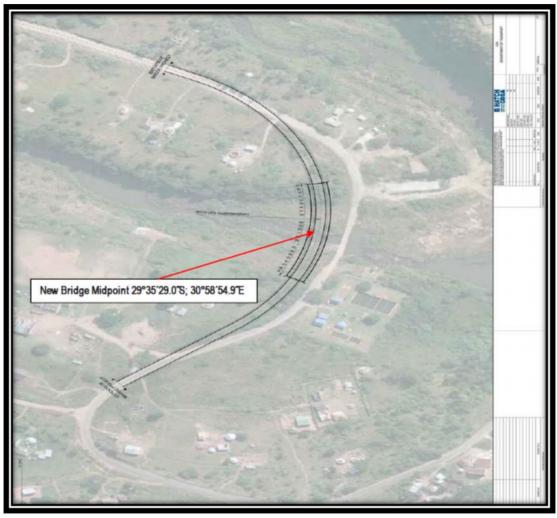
New bridge and proposed road alignment of the P713 relative to the old bridge and road (Source: KSEMS)
